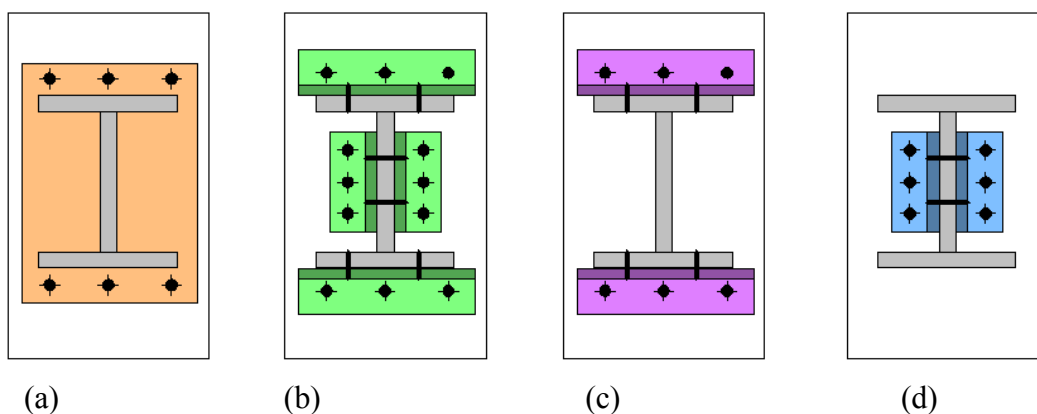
Usual beam-to-column connections: (a) End plate connection; (b) Top and seat + web angle connection; (c) Top and seat angle connection; (d) Web angles connection
